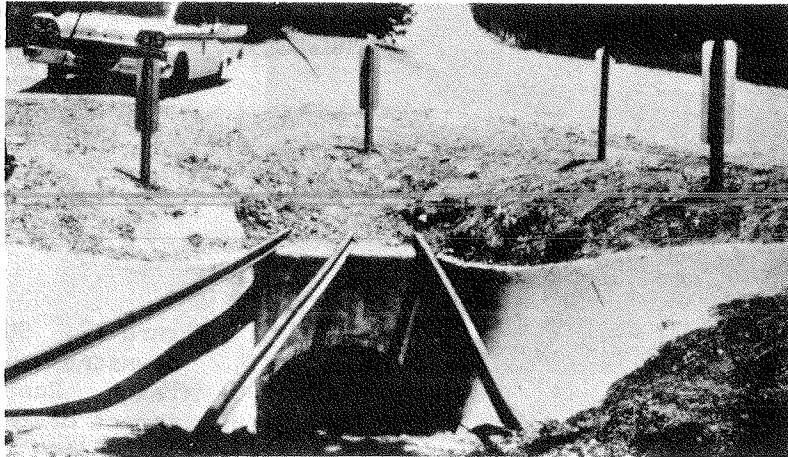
Rail debris rack over sloping inlet. Heavy debris and boulders ride over rack and leave flow to culvert unimpeded.
